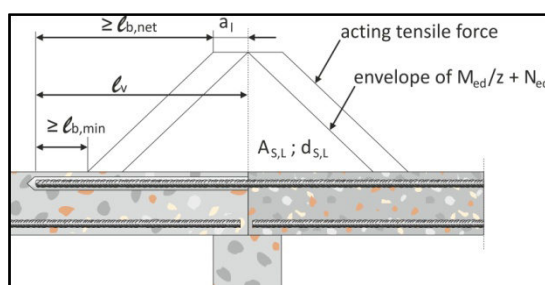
Anchoring of reinforcement to cover the line of acting tensile force
